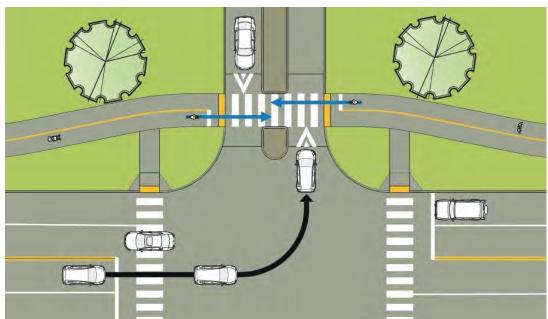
Recessed and Raised Crossing at Enhanced Sidewalk
